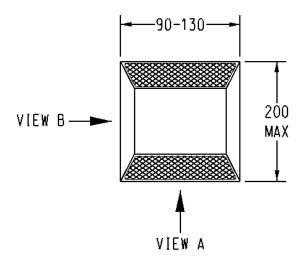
Plan view of retroreflective road pavement markers for hydrants.
